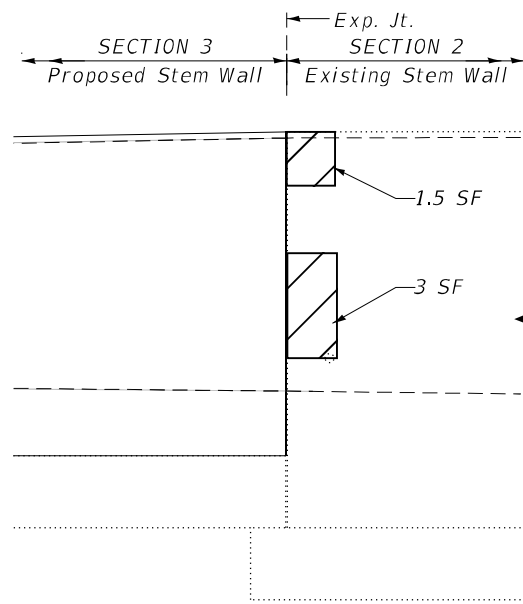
End of Section 2, Start of Section 3. Note the Spalling on Section 2.
